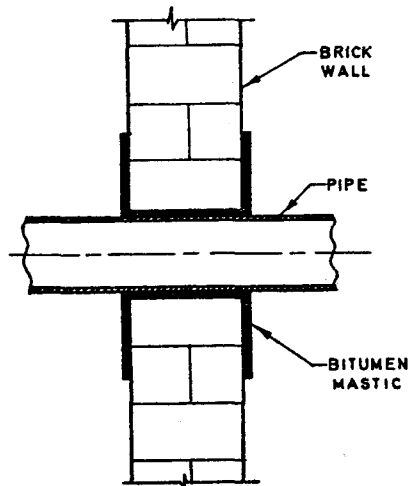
TYPICAL ARRANGEMENT OF DAMP-PROOFING AROUND A PIPE THROUGH AN OPENING
